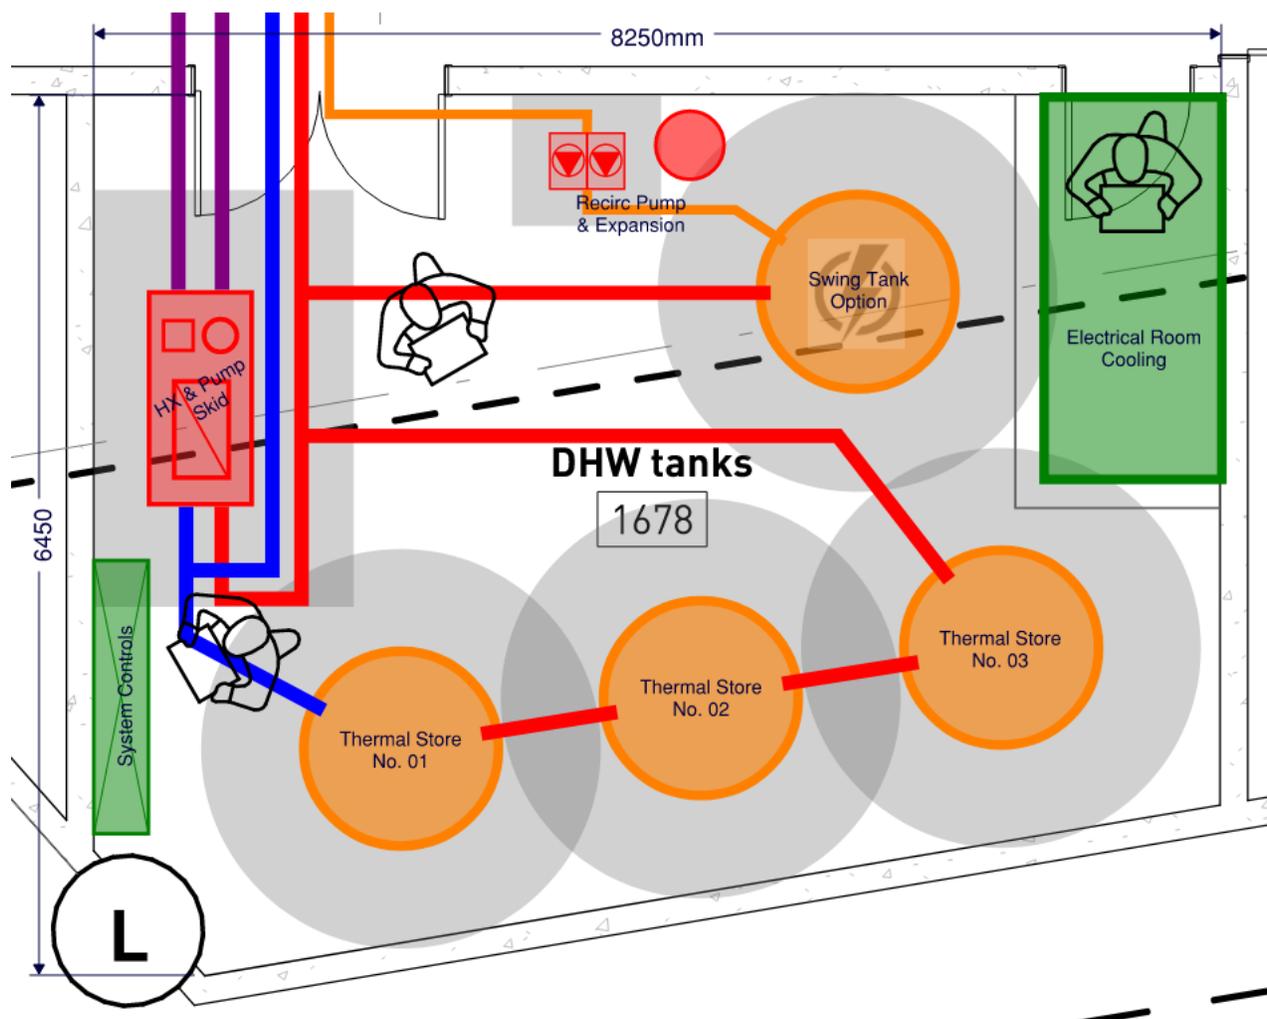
Vienna House Indoor DHW Plant Arrangement
